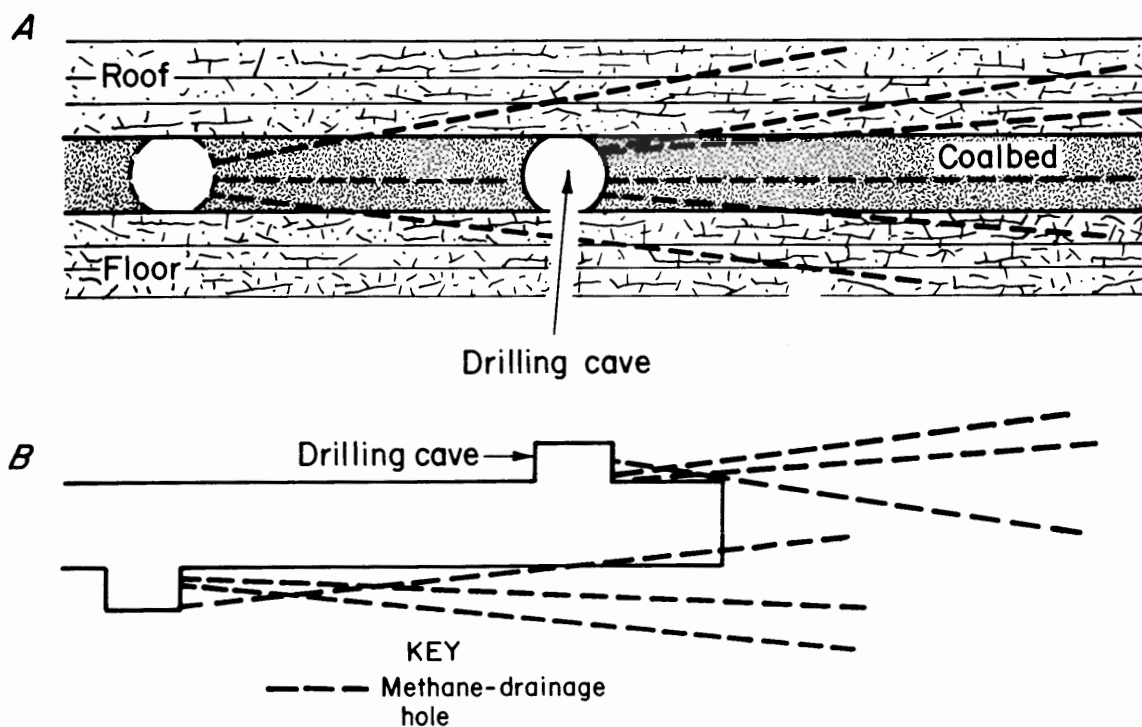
Shallow-angle methane-drainage holes drilled in advance of entry development. A, Section view; B, plan view (modified from Krzystolik (41)).
